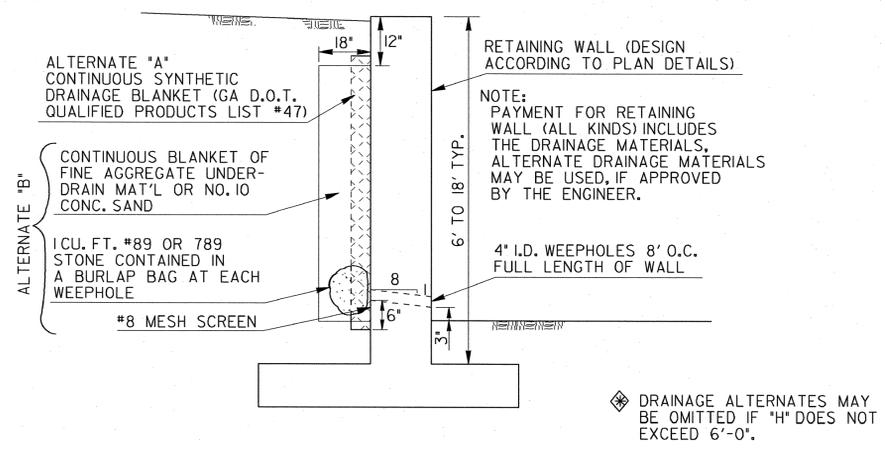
DETAILS OF RETAINING WALL TYPICAL SECTIONS
